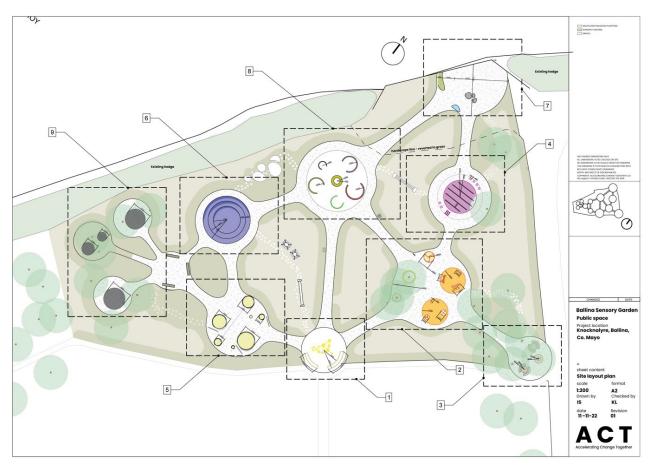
Proposed layout of sensory park at Tom Ruane Park, Ballina Co. Mayo
